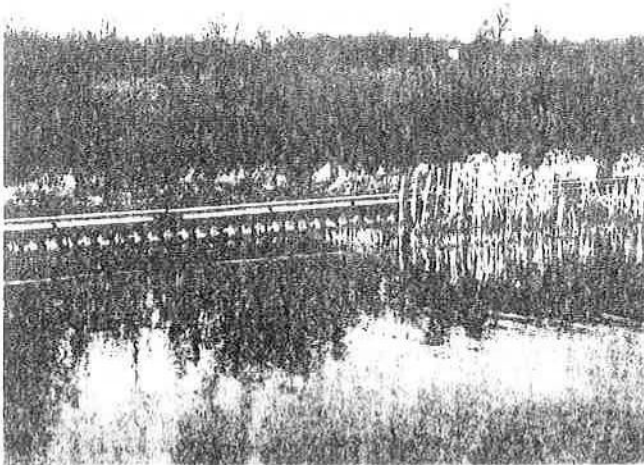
Typical use of steel trench sheeting as bank protection. (PFP)
